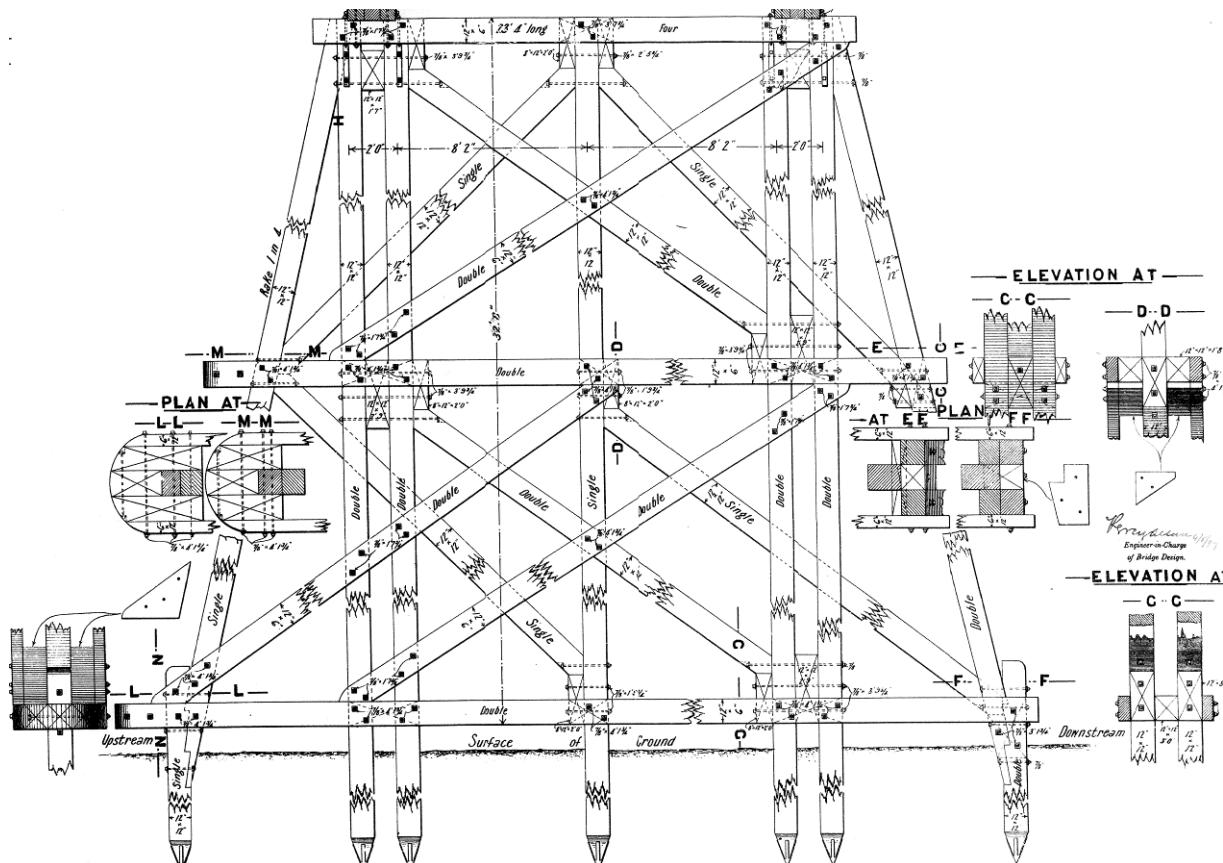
Original Details for Tall Timber Trestle Pier at Vacy Bridge over the Paterson River
